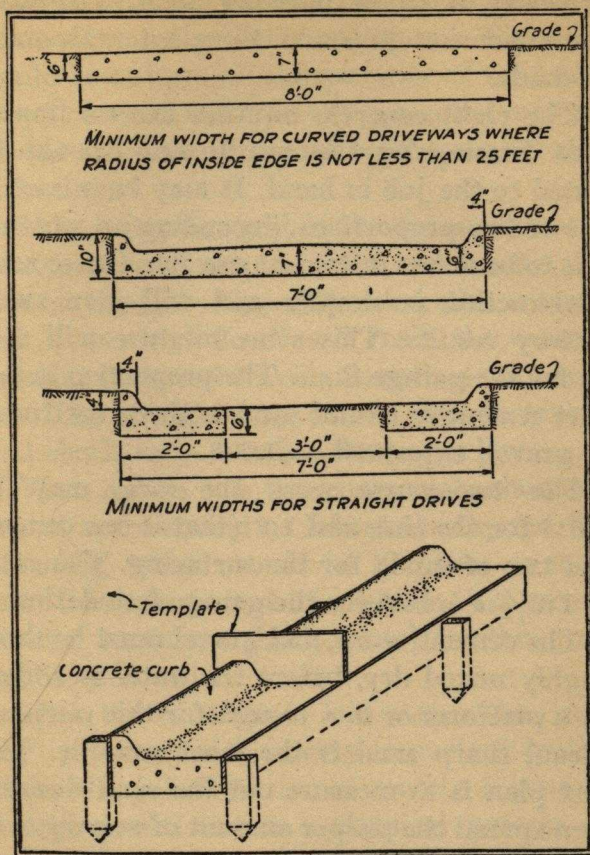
Concrete driveway construction. (Portland Cement Association.)
